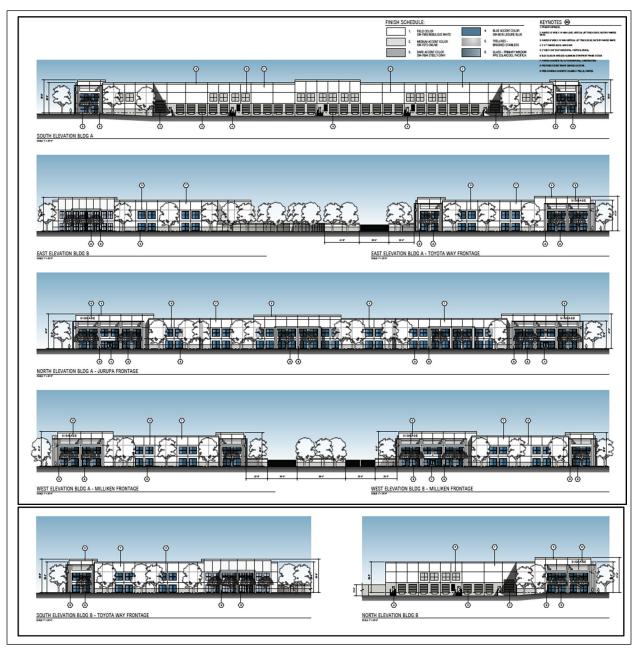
CONCEPTUAL BUILDING ELEVATIONS
